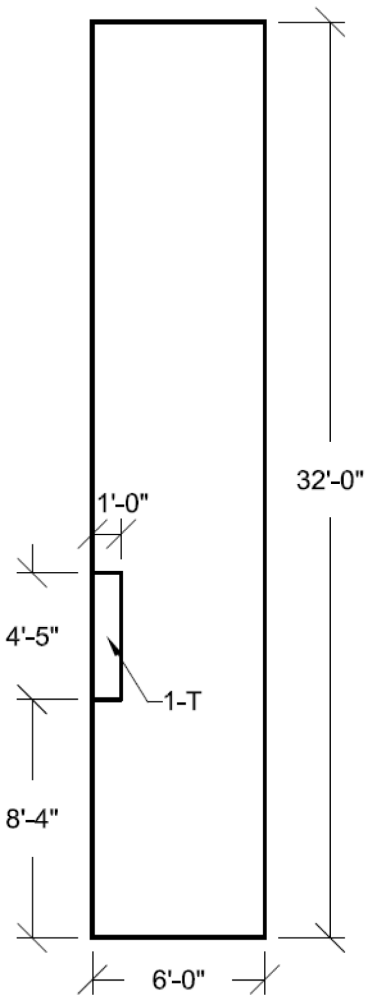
H.6-154B DGFO SV Slab 3 Looking Down
